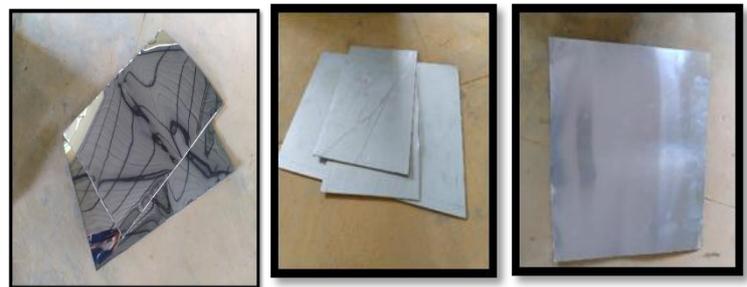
Straight sheet pile made of stain less steel(left) and GI sheet (Centre) Aluminium sheet pile(right)
